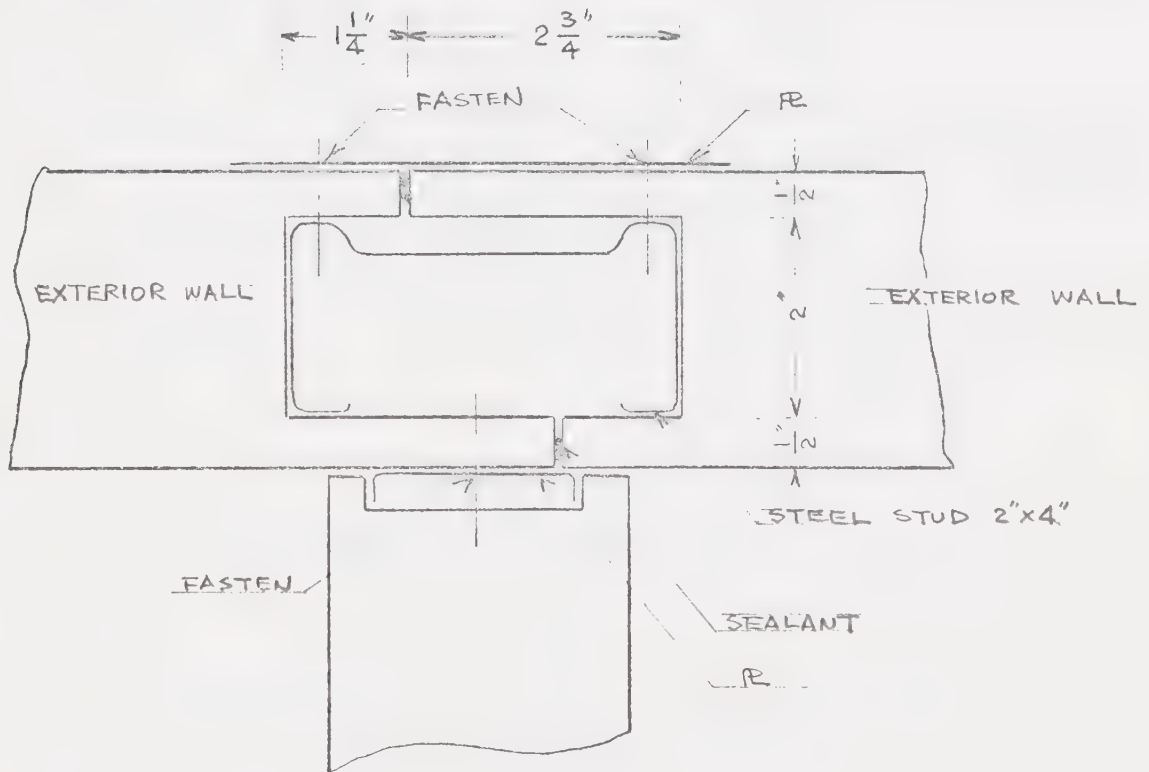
THE "T" CONNECTION FOR EXTERIOR WALL PANELS
